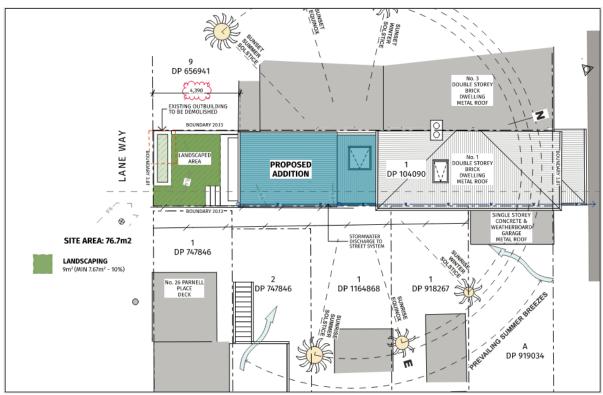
Proposed site plan demonstrating lot width and existing building setbacks.
